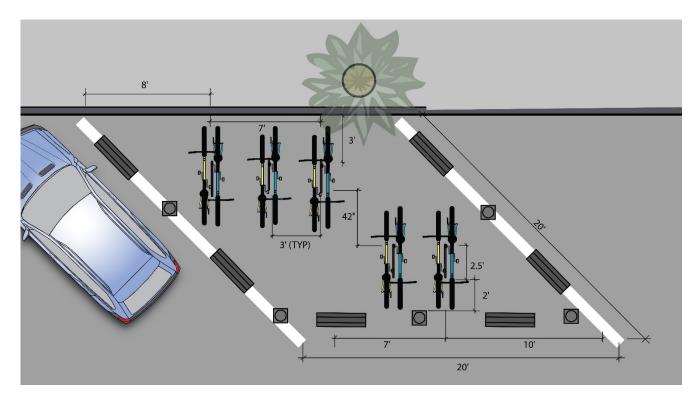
Sample Corral Layout Adjacent to Angled Parking
